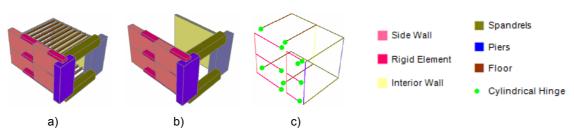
Numerical Model (Jesus, 2007): a) Floor beams; b) Interior Wall; c) Frame Elements.
